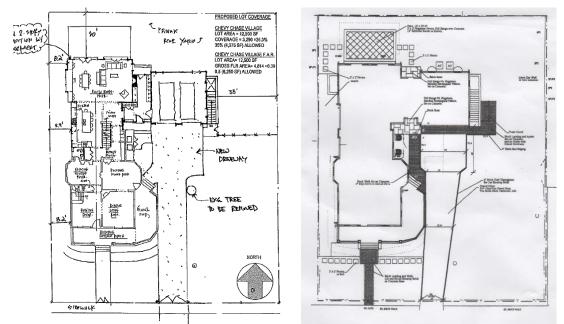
Previous site plan approved at the July 12, 2017 HPC meeting (left) and current site plan proposal (right).
